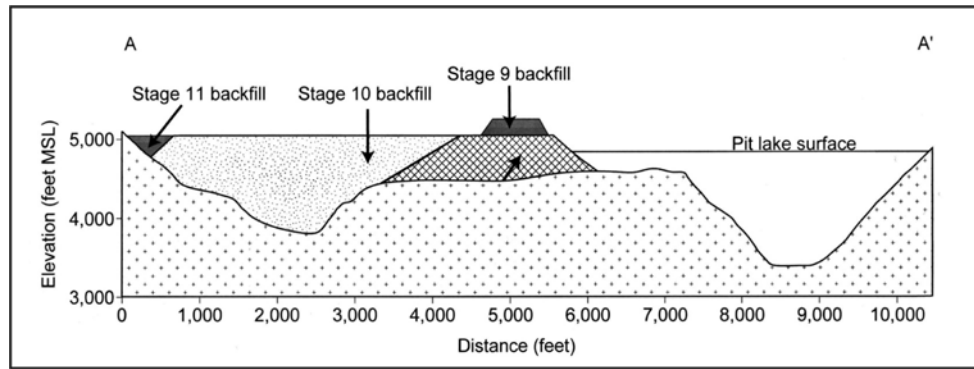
Stage 11 Cross Section A to A' through Pipeline/South Pipeline Open Pit
